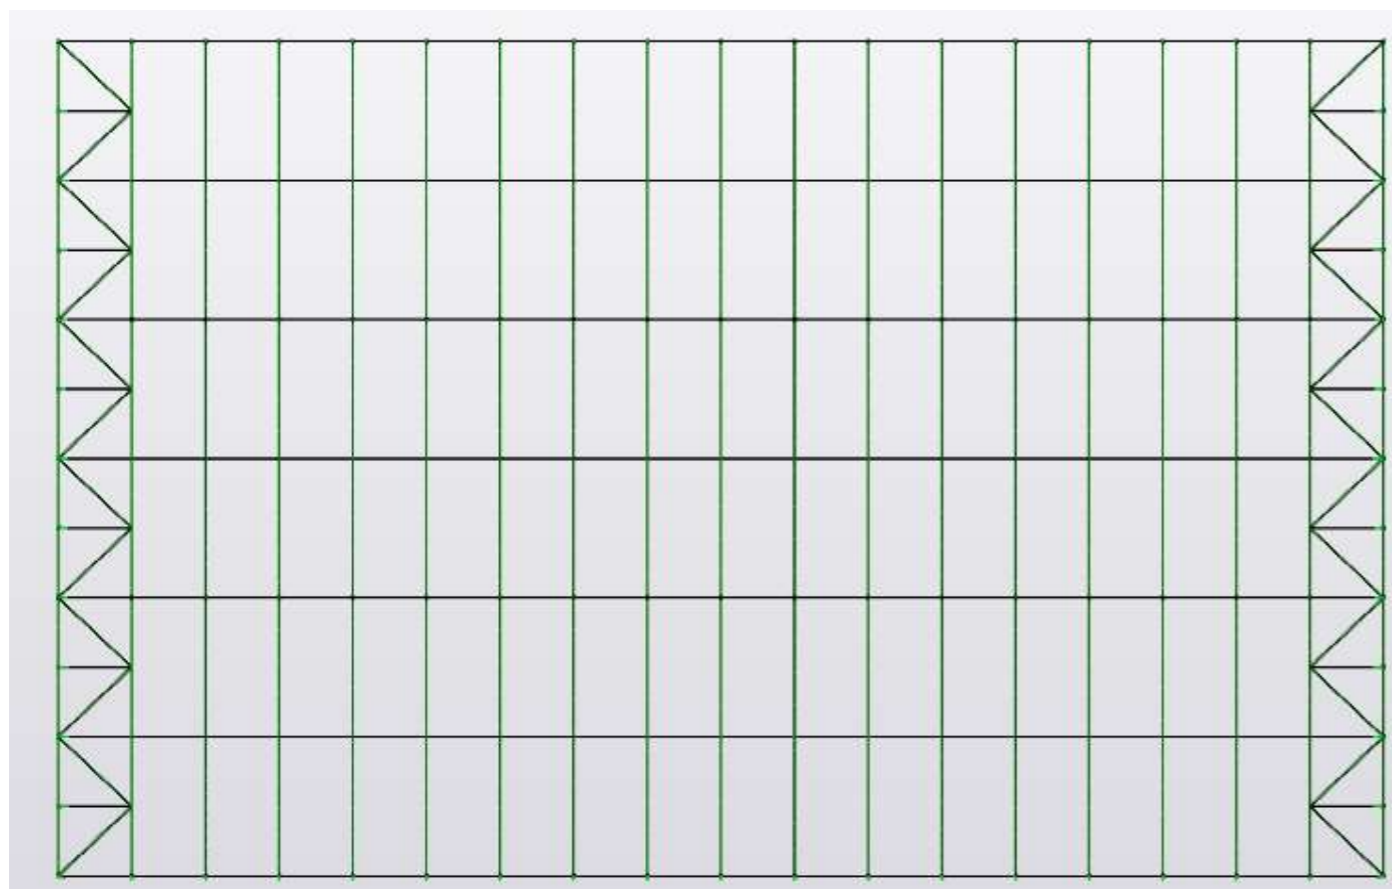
Typical Plan View of Roof Bracing (Portal Frames at 6.793m Centres)
